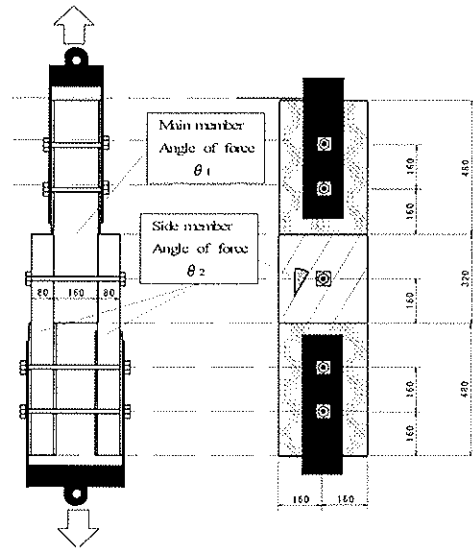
Specimens for the test of the bolted double shear timber-to-timber joint. (Unit: mm)
